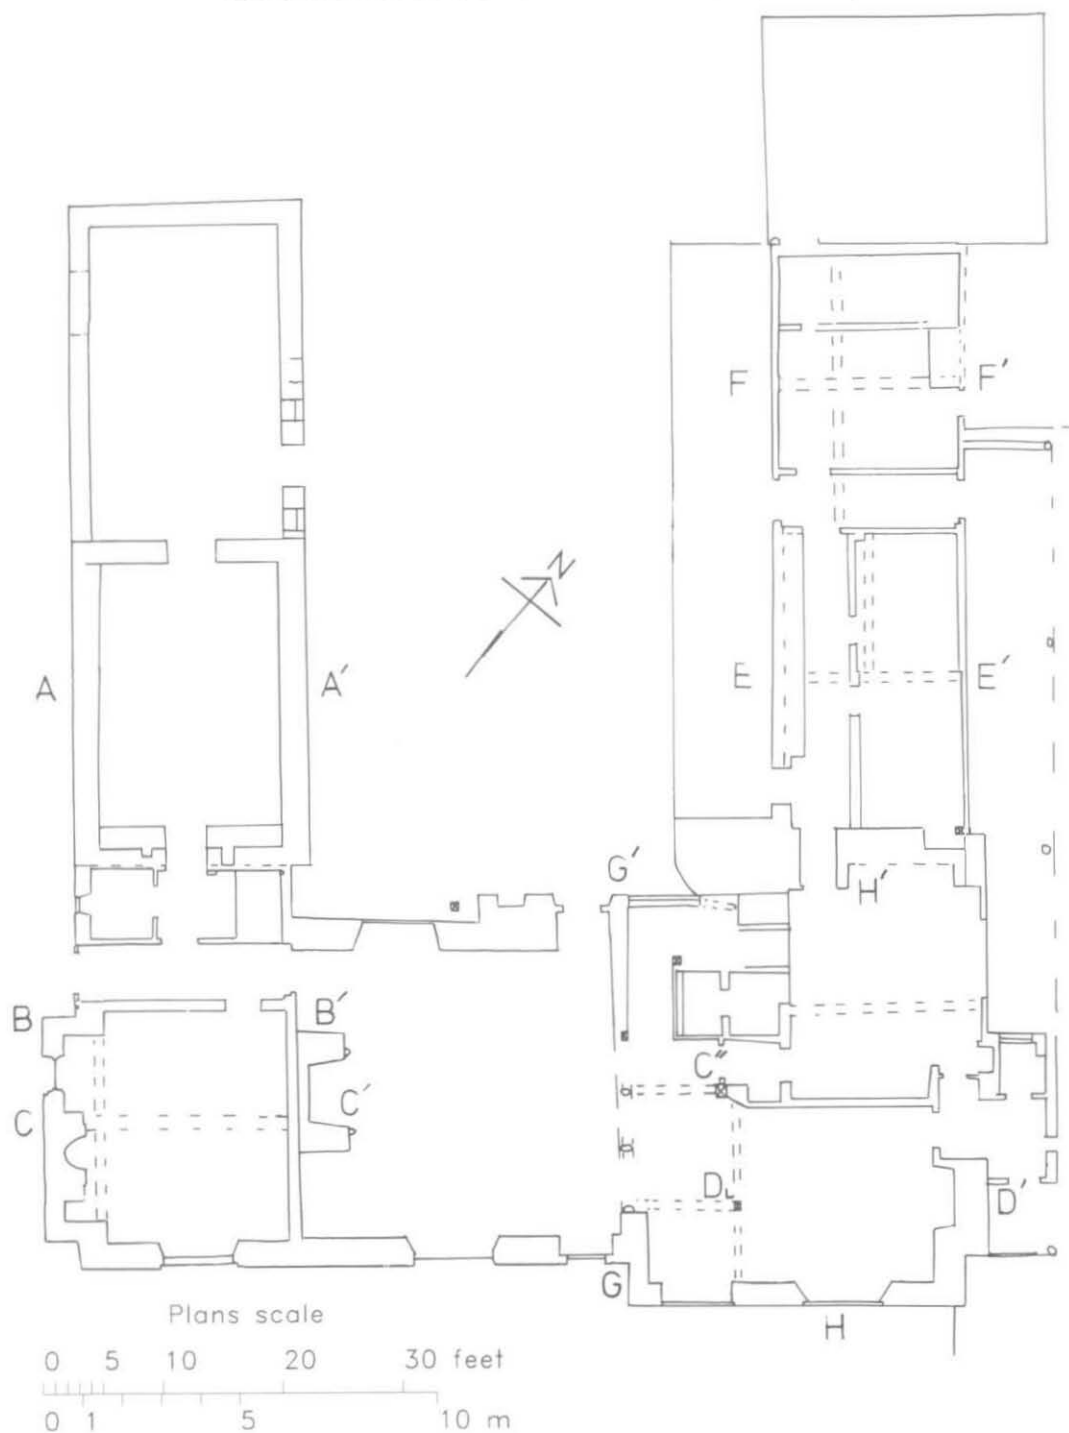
Manor House, Sutton Courtenay: ground floor plan.
